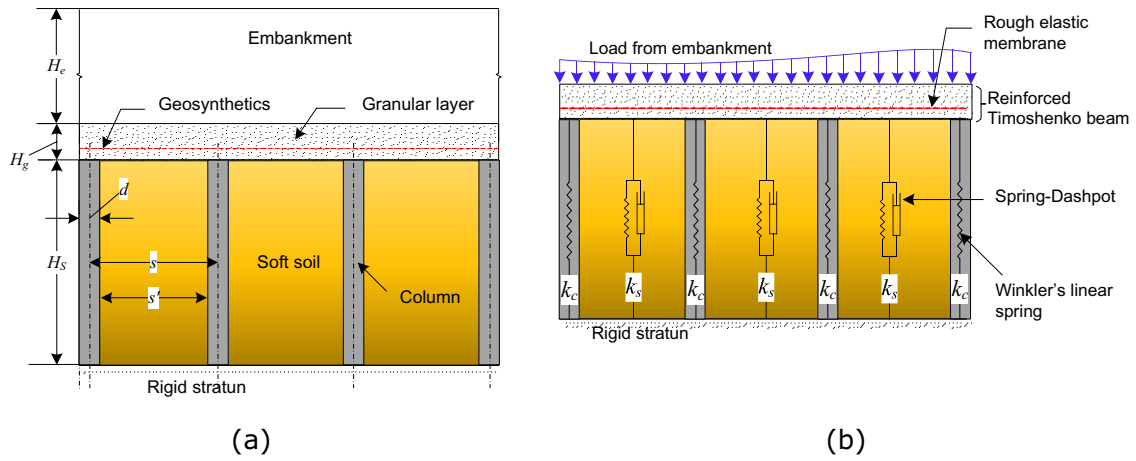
Sketch of: (a) embankment resting on CIC-improved soft soil and (b) proposed foundation model.
